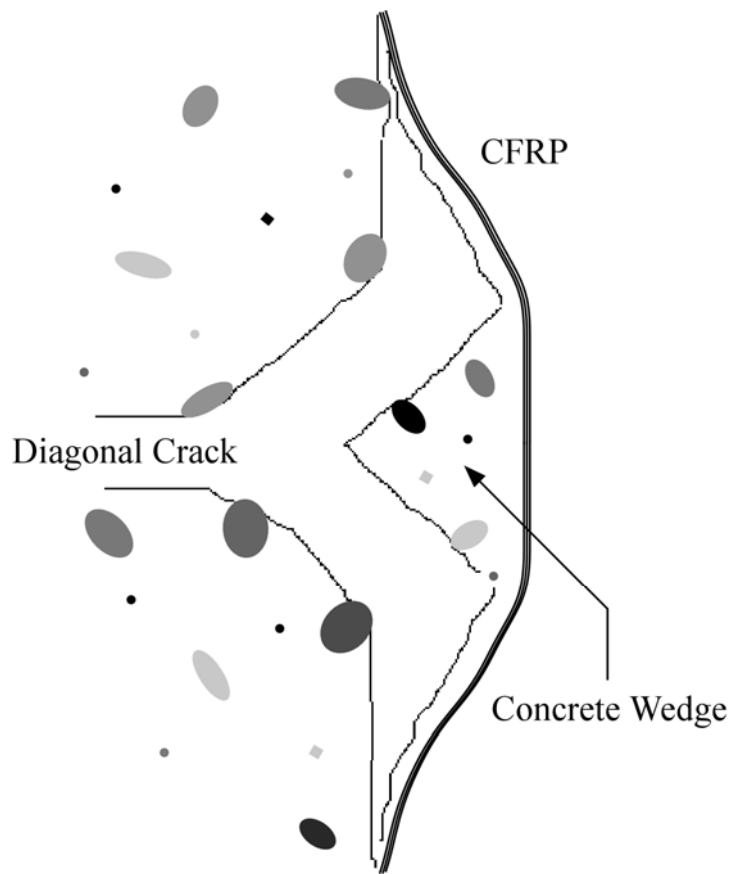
Illustrated section view of debonded CFRP at a diagonal crack.
